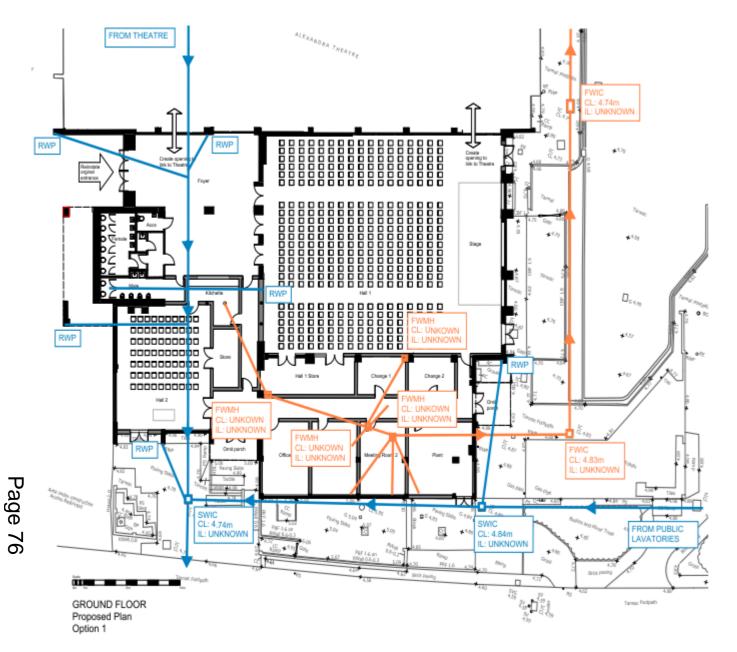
Proposed Option 1 Layout showing Historic Drainage Layout
